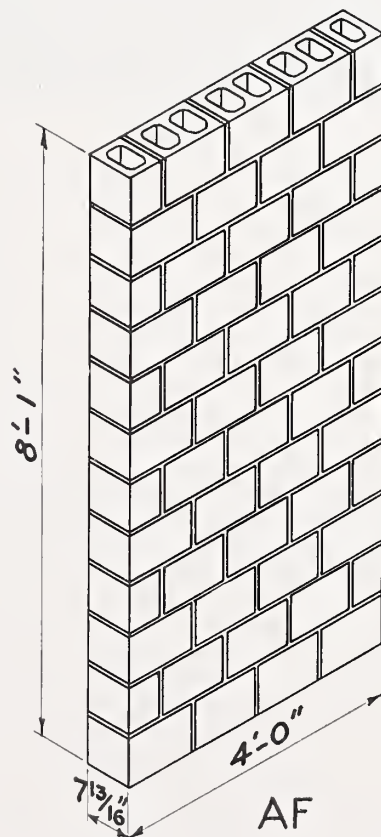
Four-foot stone-concrete block wall specimen AF.
